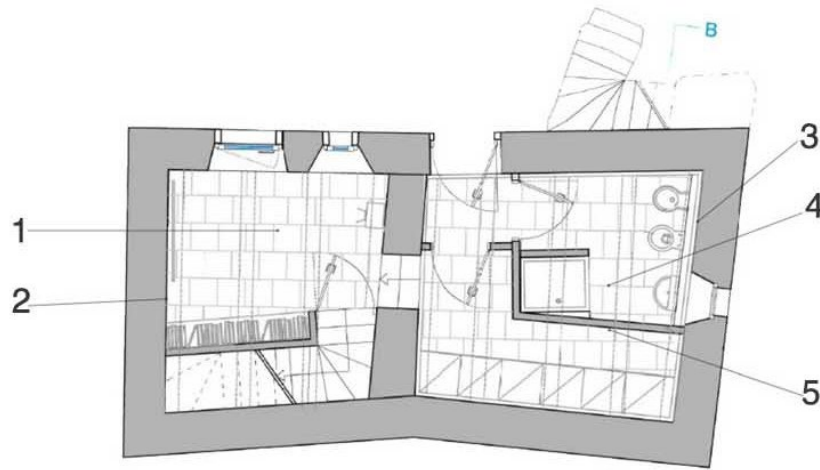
Casa Dell'affresco Detail of the works planned on the first floor - House of Arches, FoRTI, 2022
